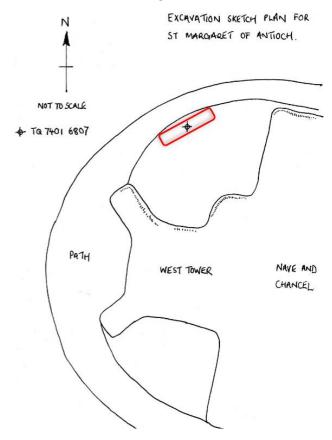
Excavation sketch plan for the replacement of an existing drain, St Margaret of Antioch
